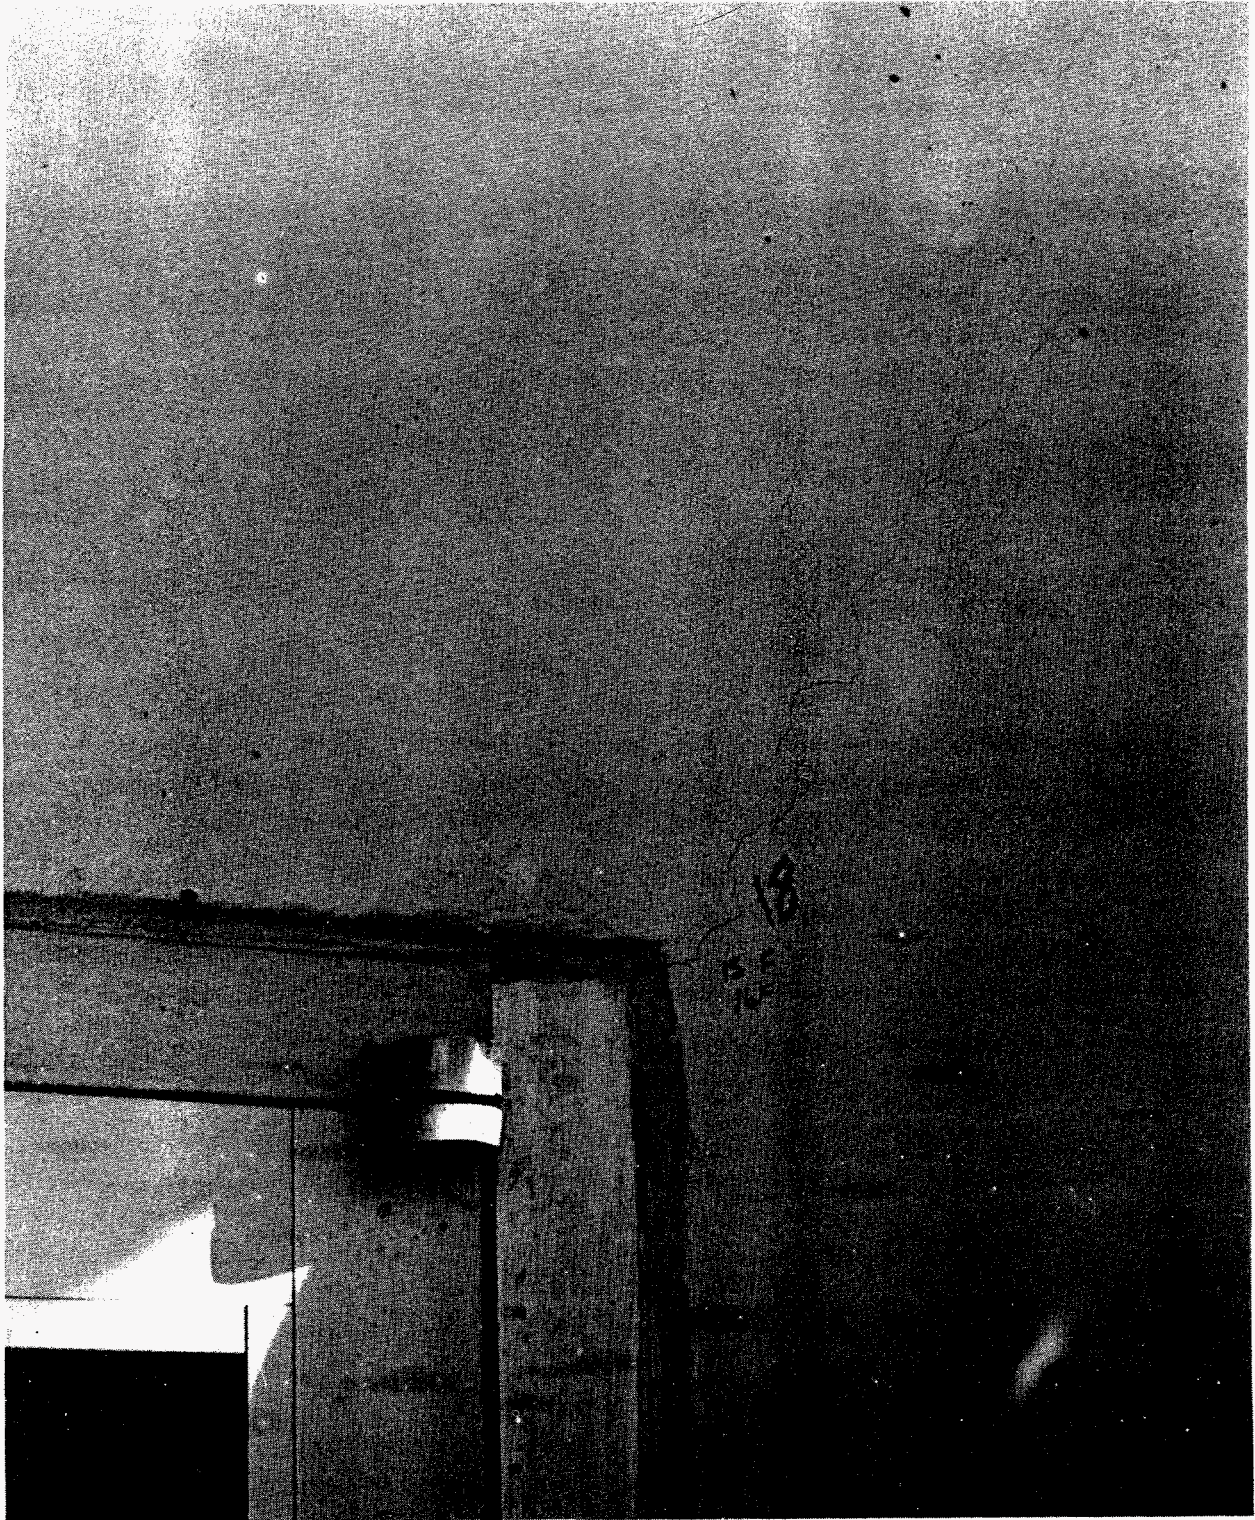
Building 725, minute diagonal crack over main door, intermediate inspection.
